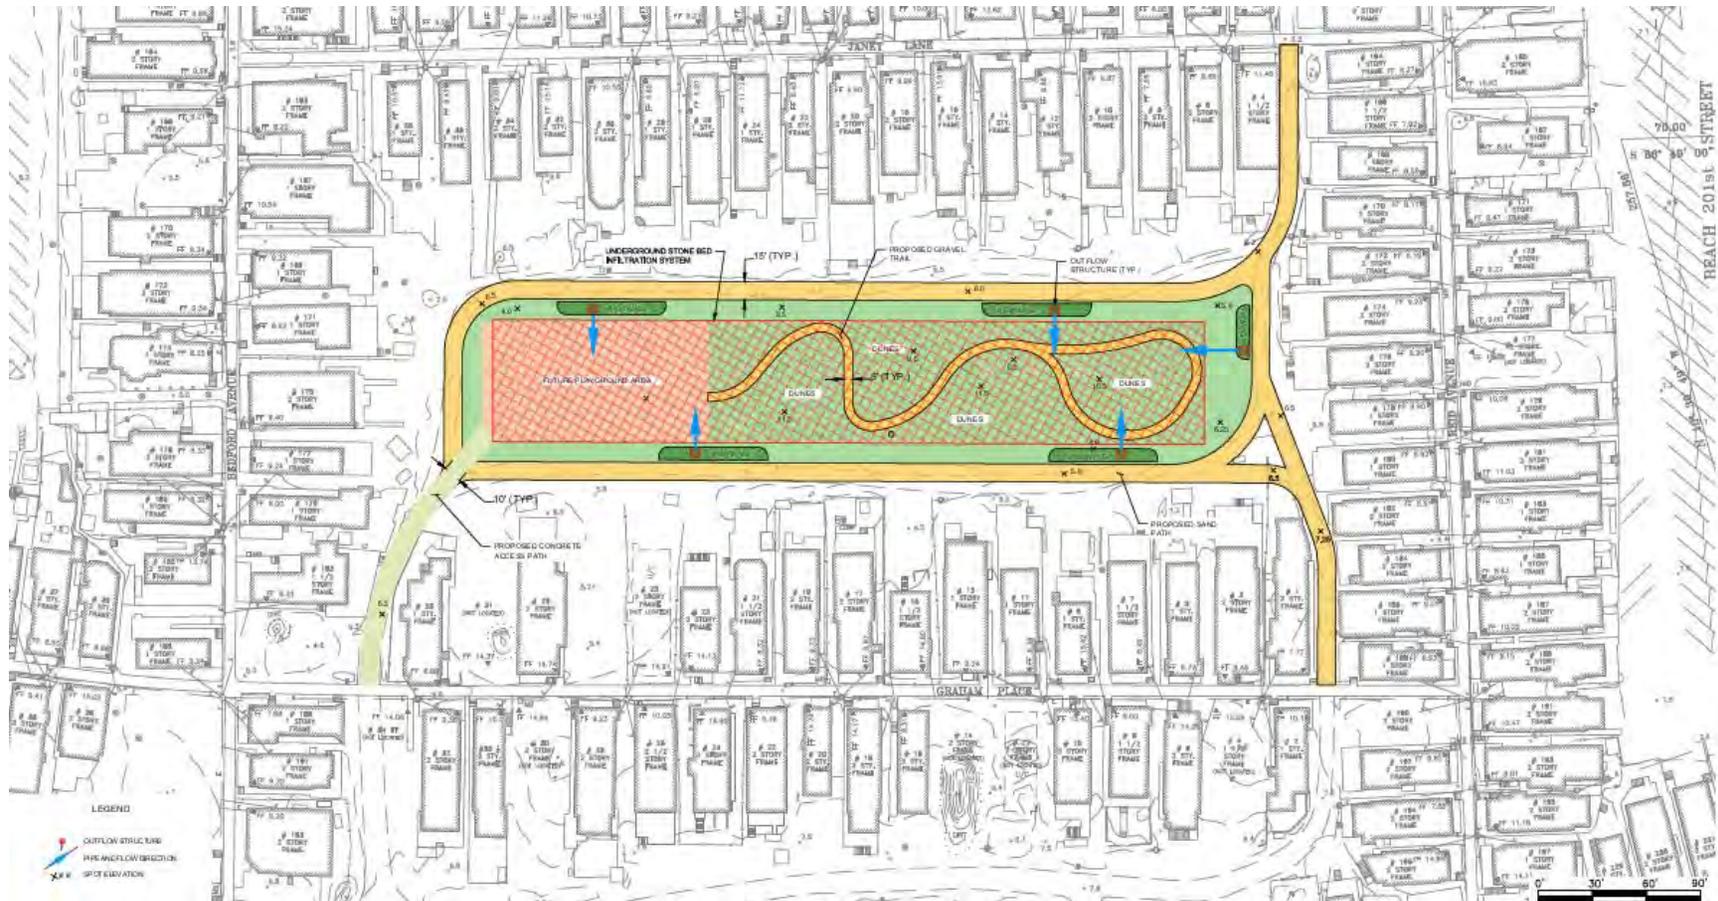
Breezy Point Residential Area Proposed Site Plan.
